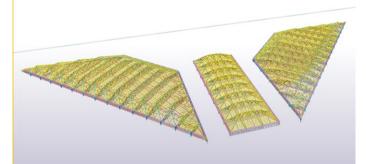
The 3D Model of Commercial Roofs and West & East Wing Roofs
